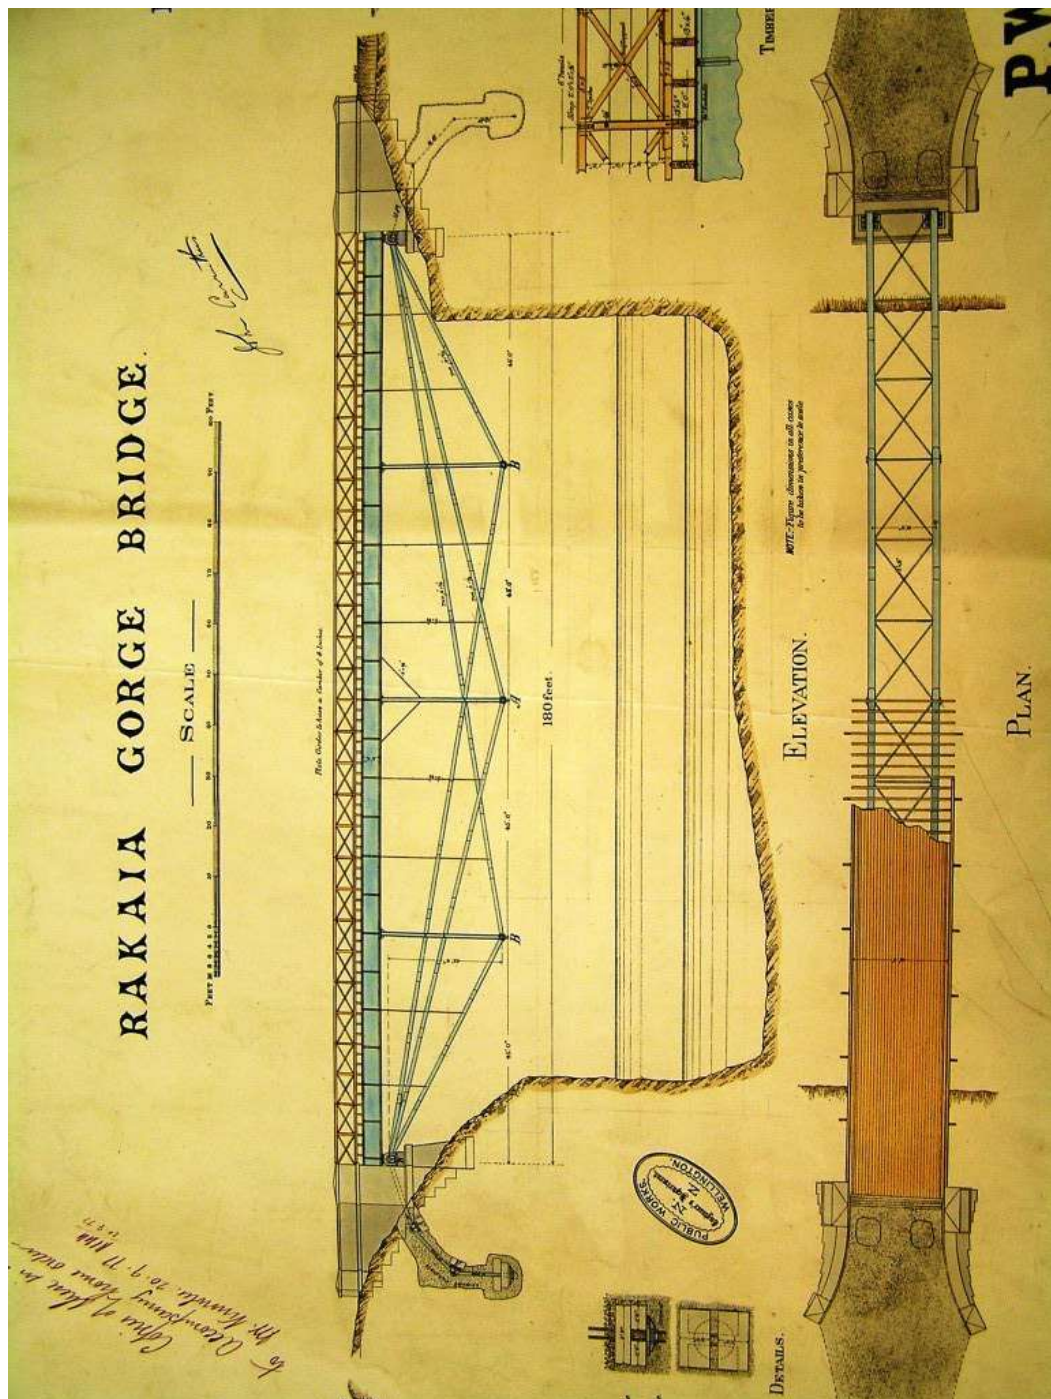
Rakaia Gorge Bridge, plan elevation and details of bridge, 1877, PWD 5361 [sheet 1 detail]. Archives New Zealand/Te Rua Mahara o te Kāwanatanga Wellington Office, ACHL 22541 W5/3026 5971
